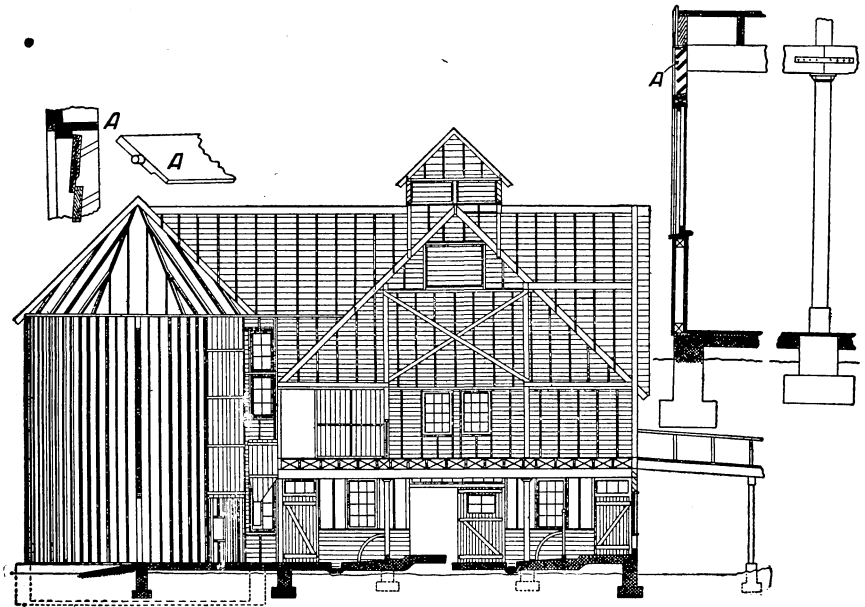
Cross section showing details of construction of stable shown in fig. 9.
